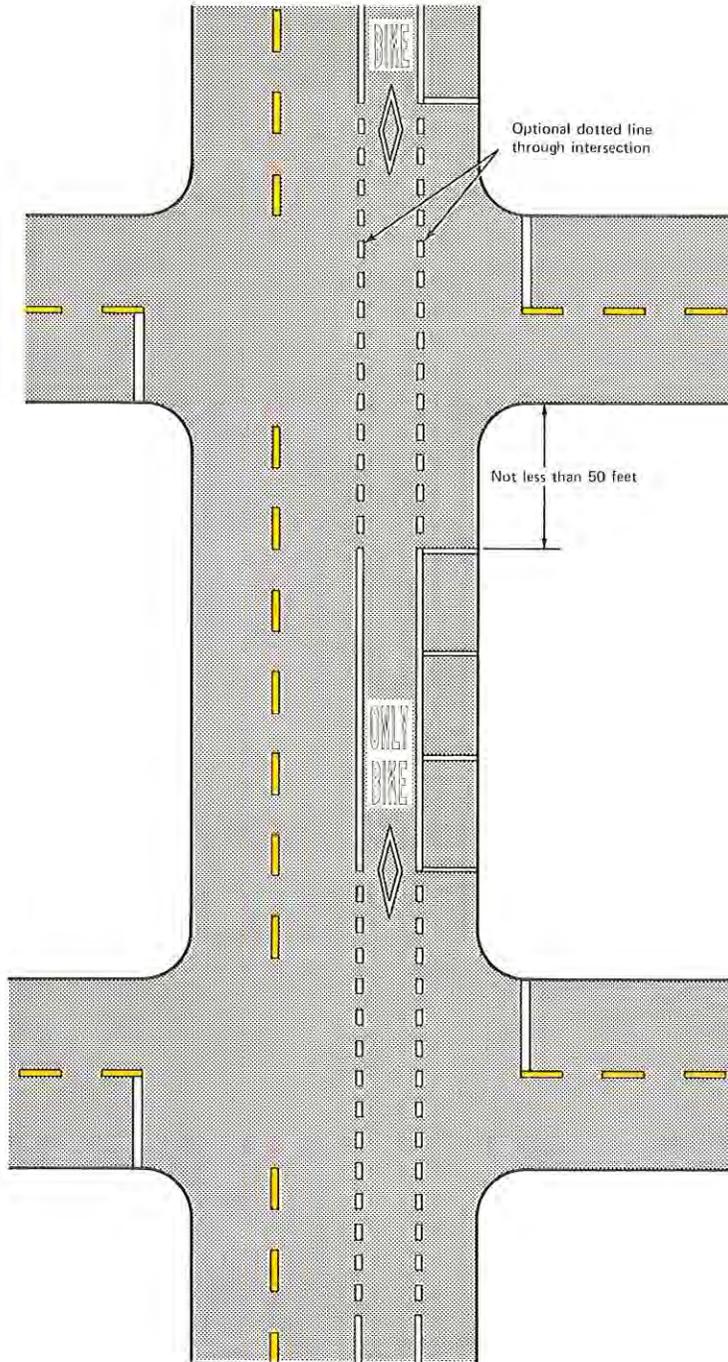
Typical pavement markings—designated bicycle lane, two-way traffic with parking and low right turn volume.
